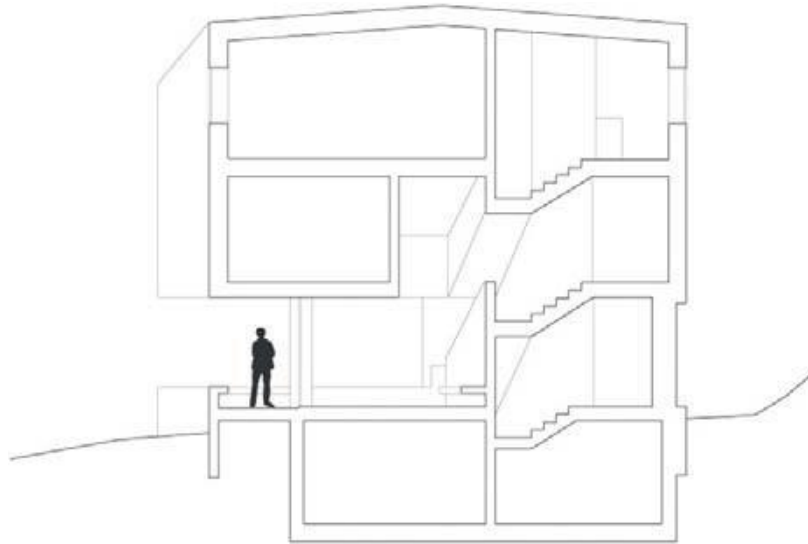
Modern Building Entrance, the idea, also evident in traditional buildings, to have the roof above the entrance, to enter the building from the covered area. (Source: Kalvelage, 2016)
